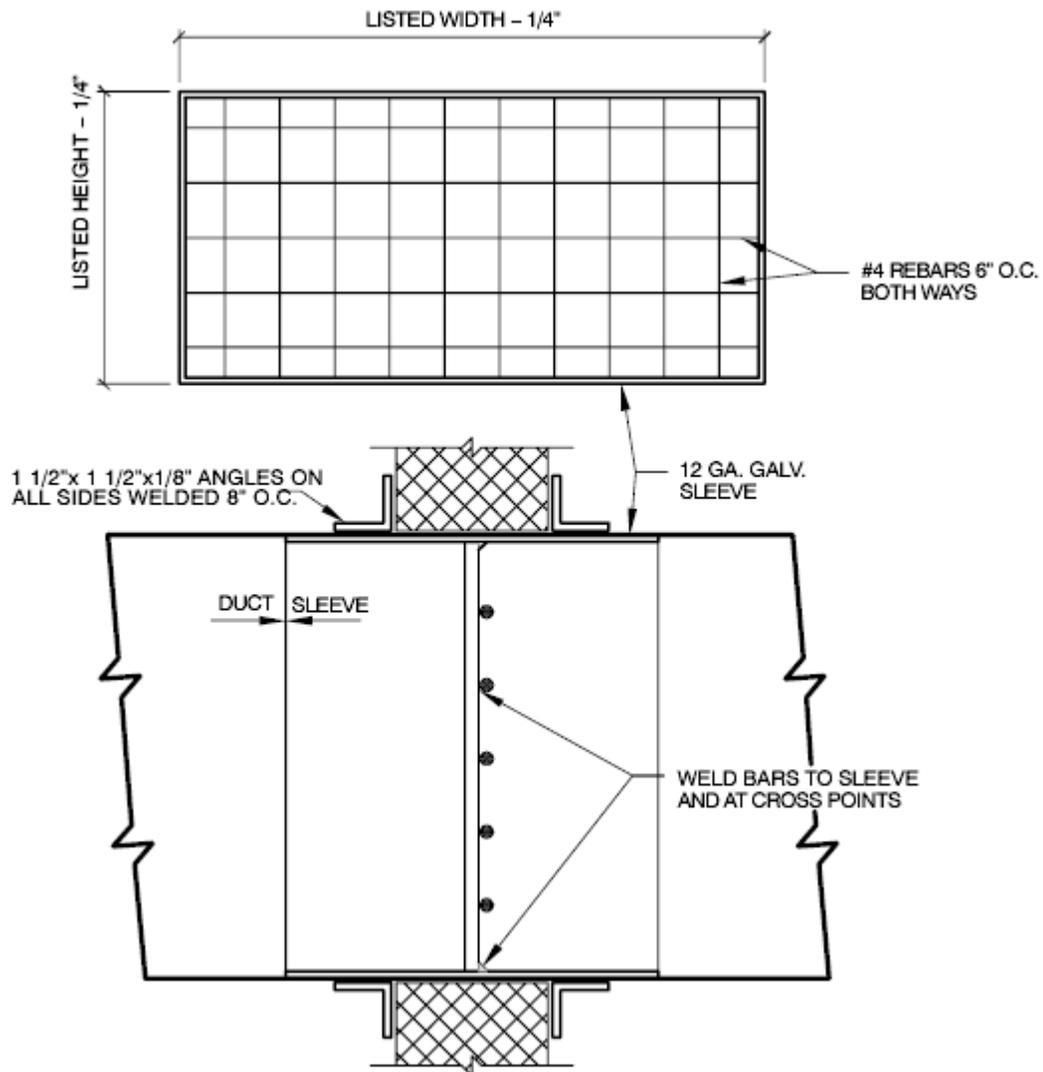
ALTERNATIVE SECURITY BARRIER DETAIL
